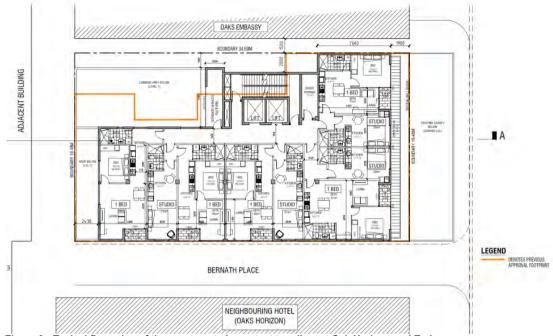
Typical floor plan of the apartments in context to adjacent Oak Horizon and Embassy.
